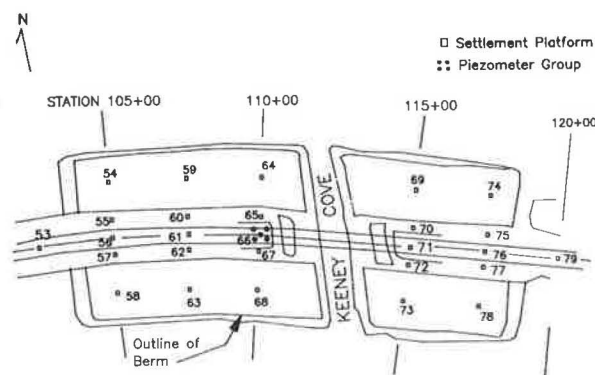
Layout of instrumentation at the area without vertical drains at Putnam Bridge (note location of SP-66 and piezometer group).
